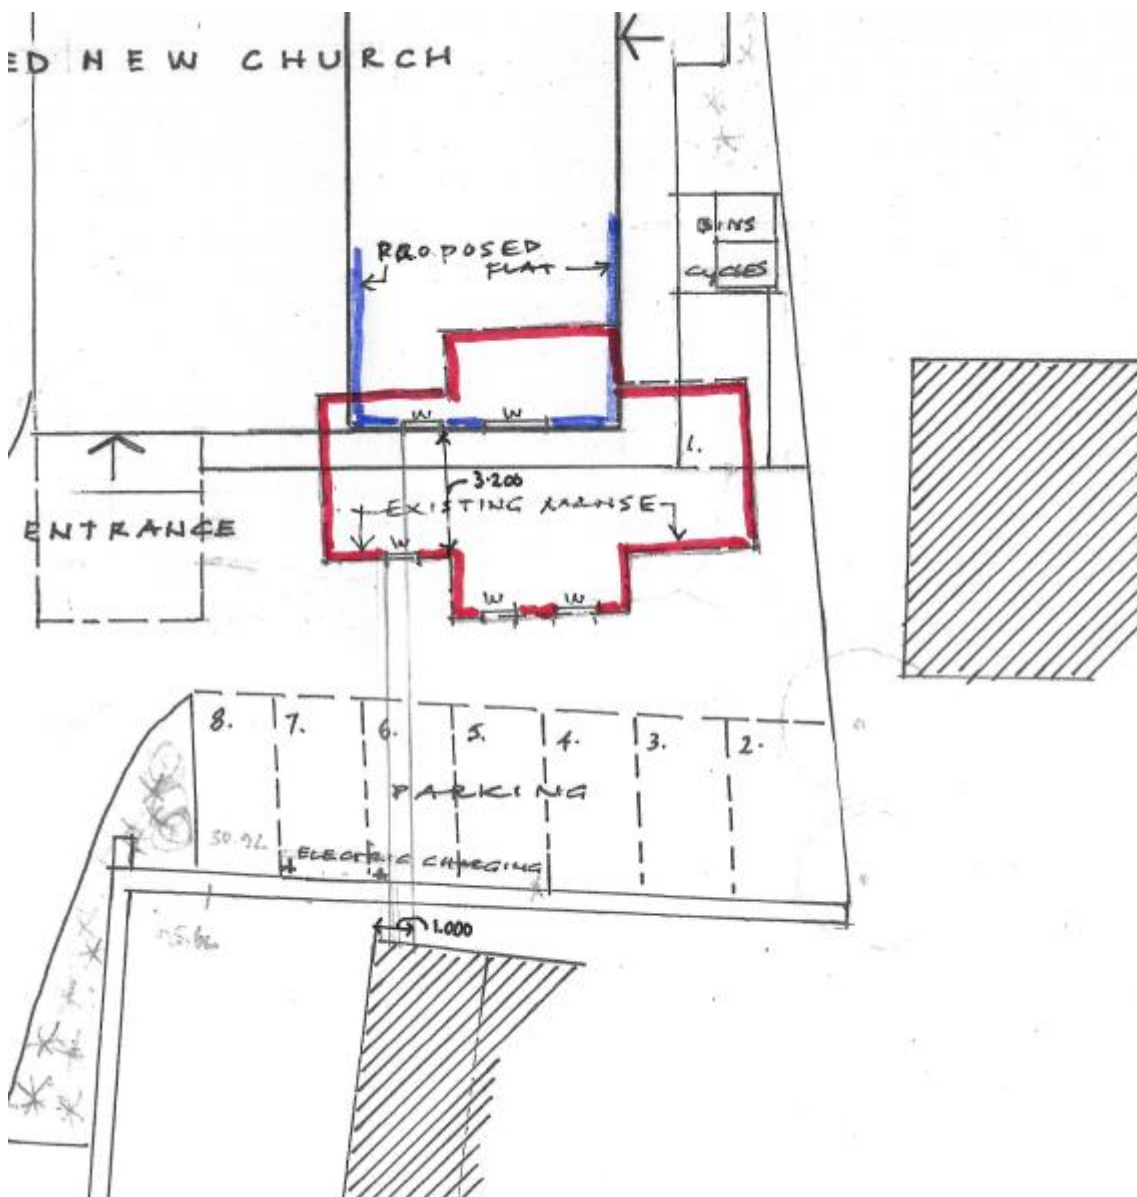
relationship between first floor windows in the existing Manse and proposed flat with No. 28 Chaveywell Court to the south.
